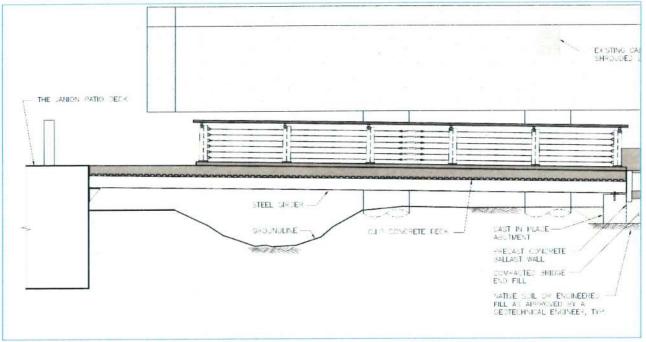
Proposed Underpass Bridge Structure / Connection to Janion Building.
